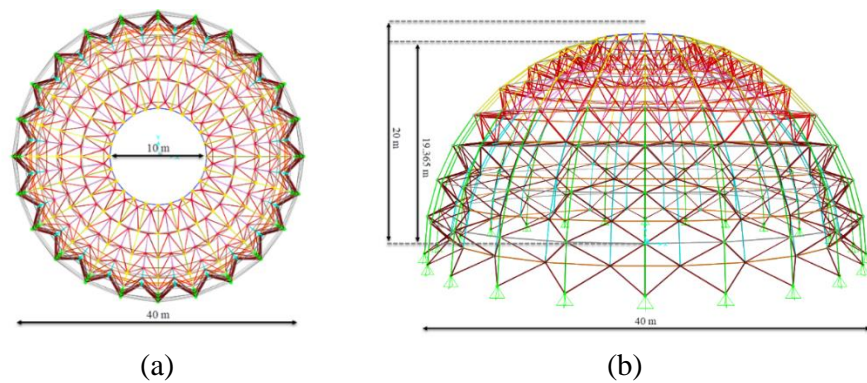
1512-bar dome truss: a) Top view, b) Side view
